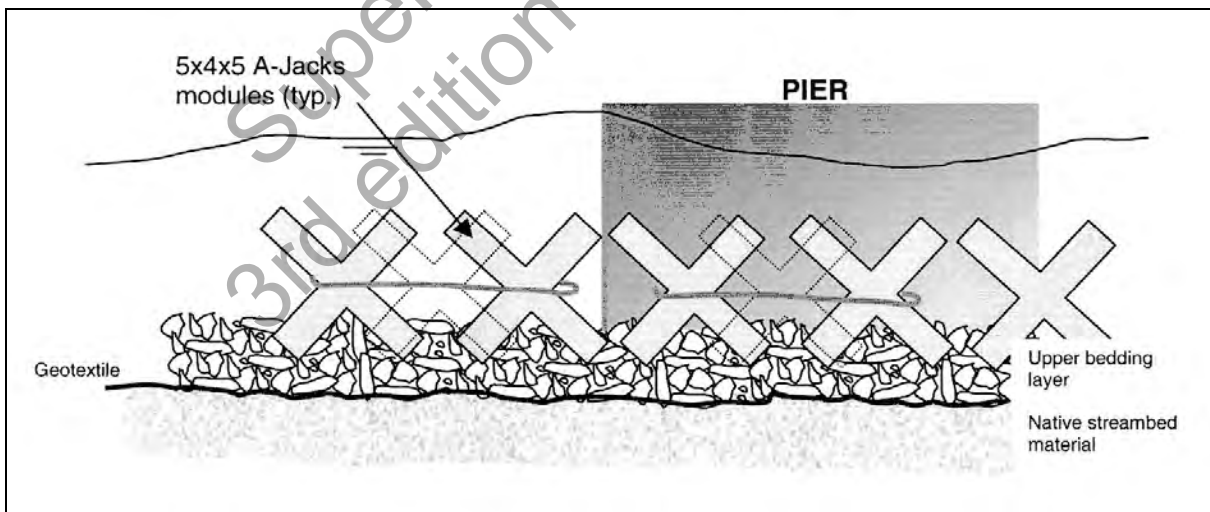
Bedding detail showing ballast stone on top of geotextile.⁽¹²⁾
